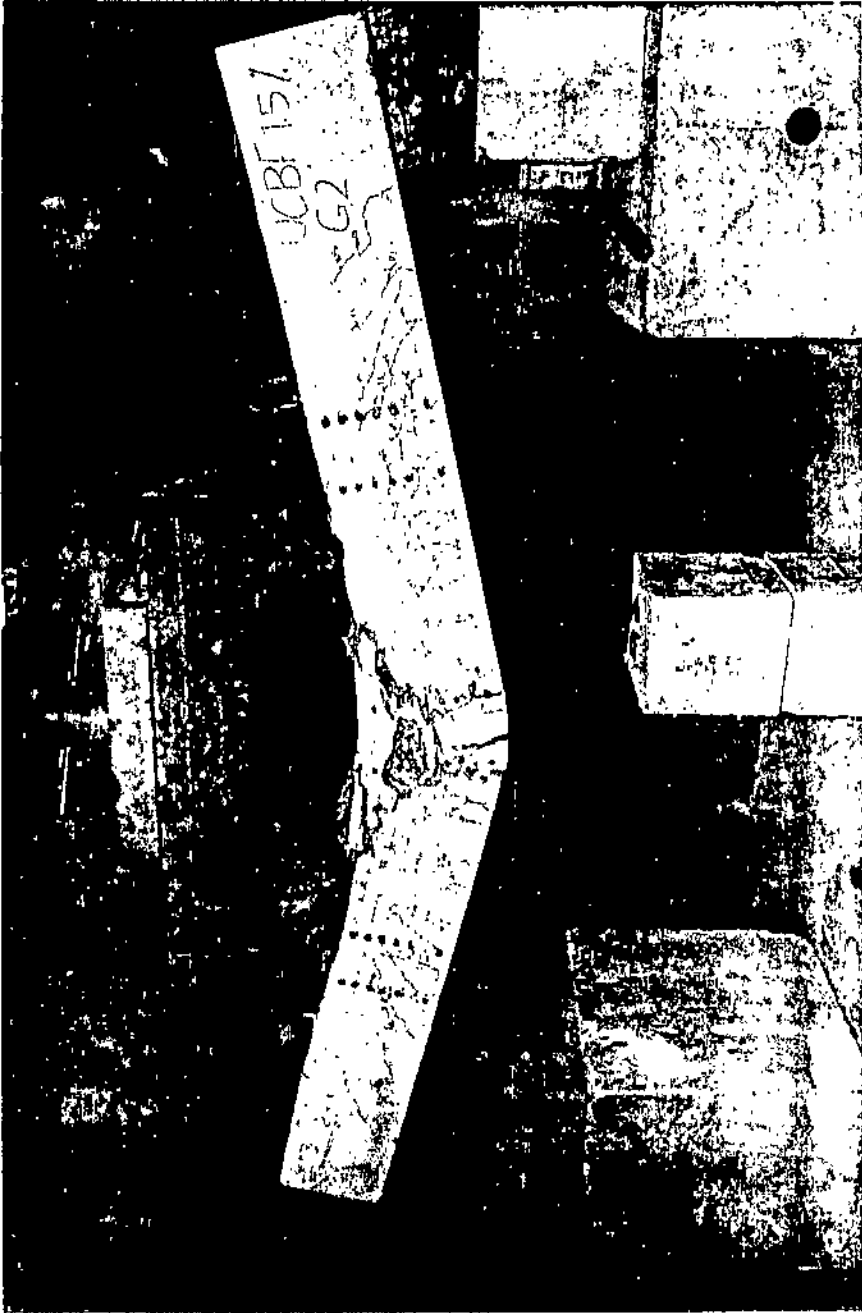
TYPICAL CRACK PATTERNS FOR BEAM # 12
